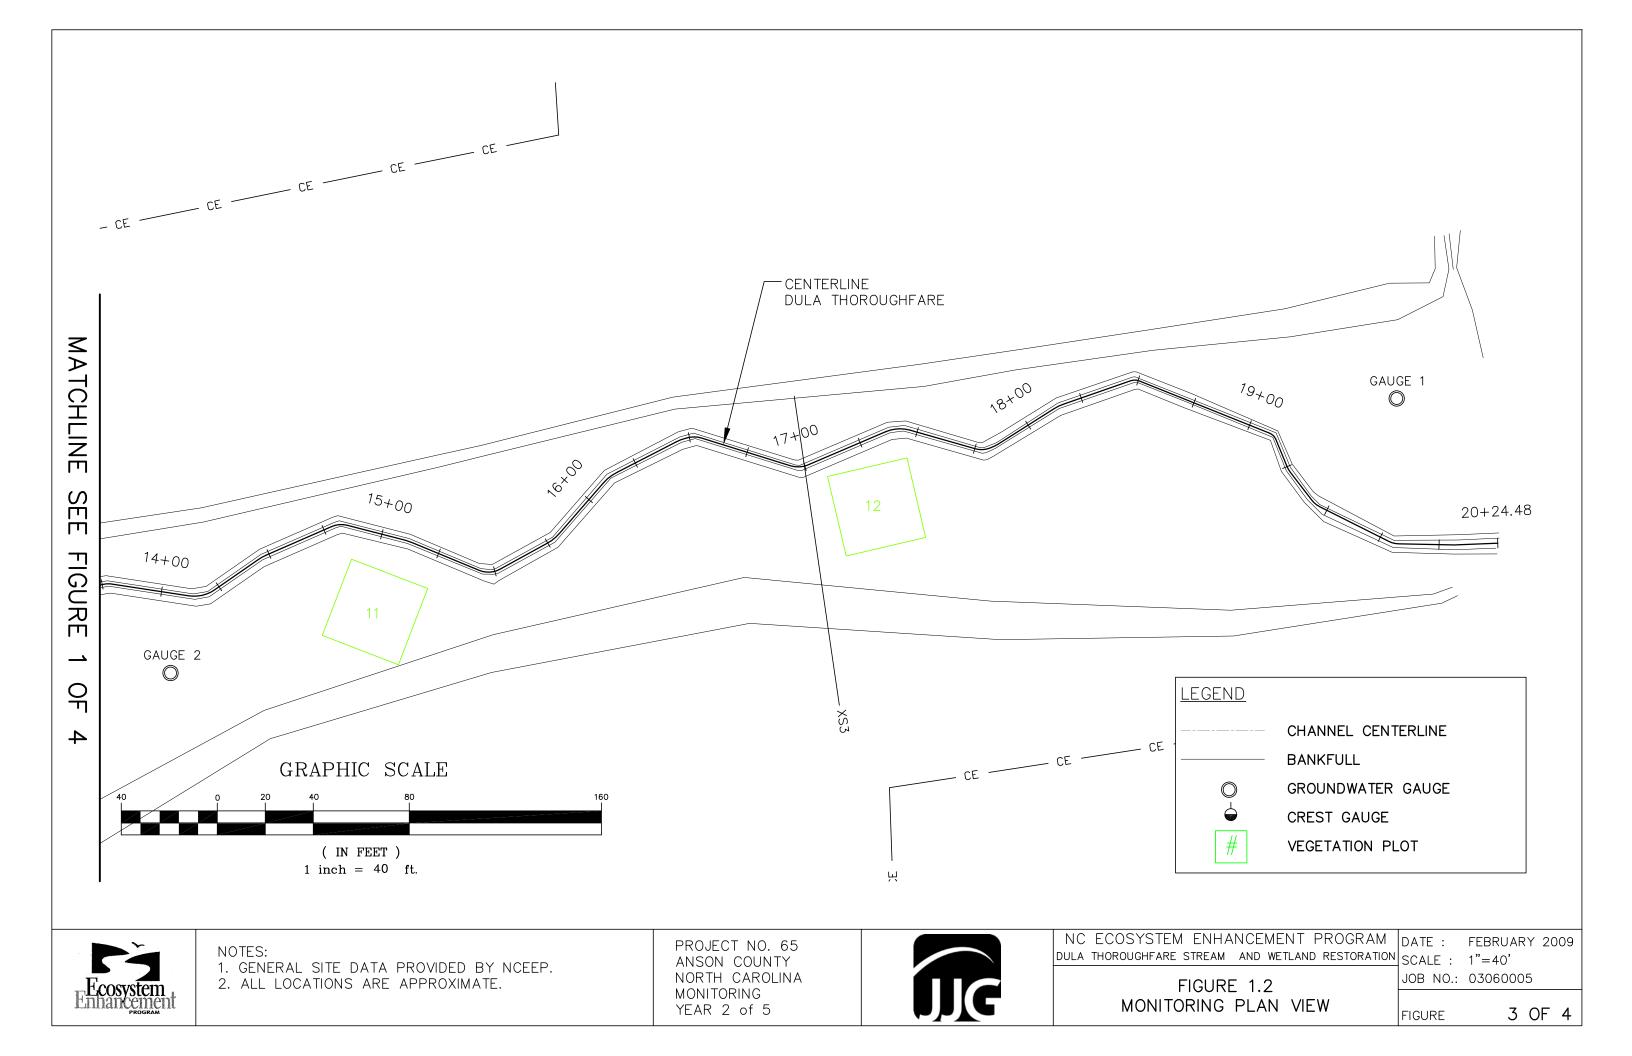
MONITORING PLAN VIEW JOB NO.: 03060005
